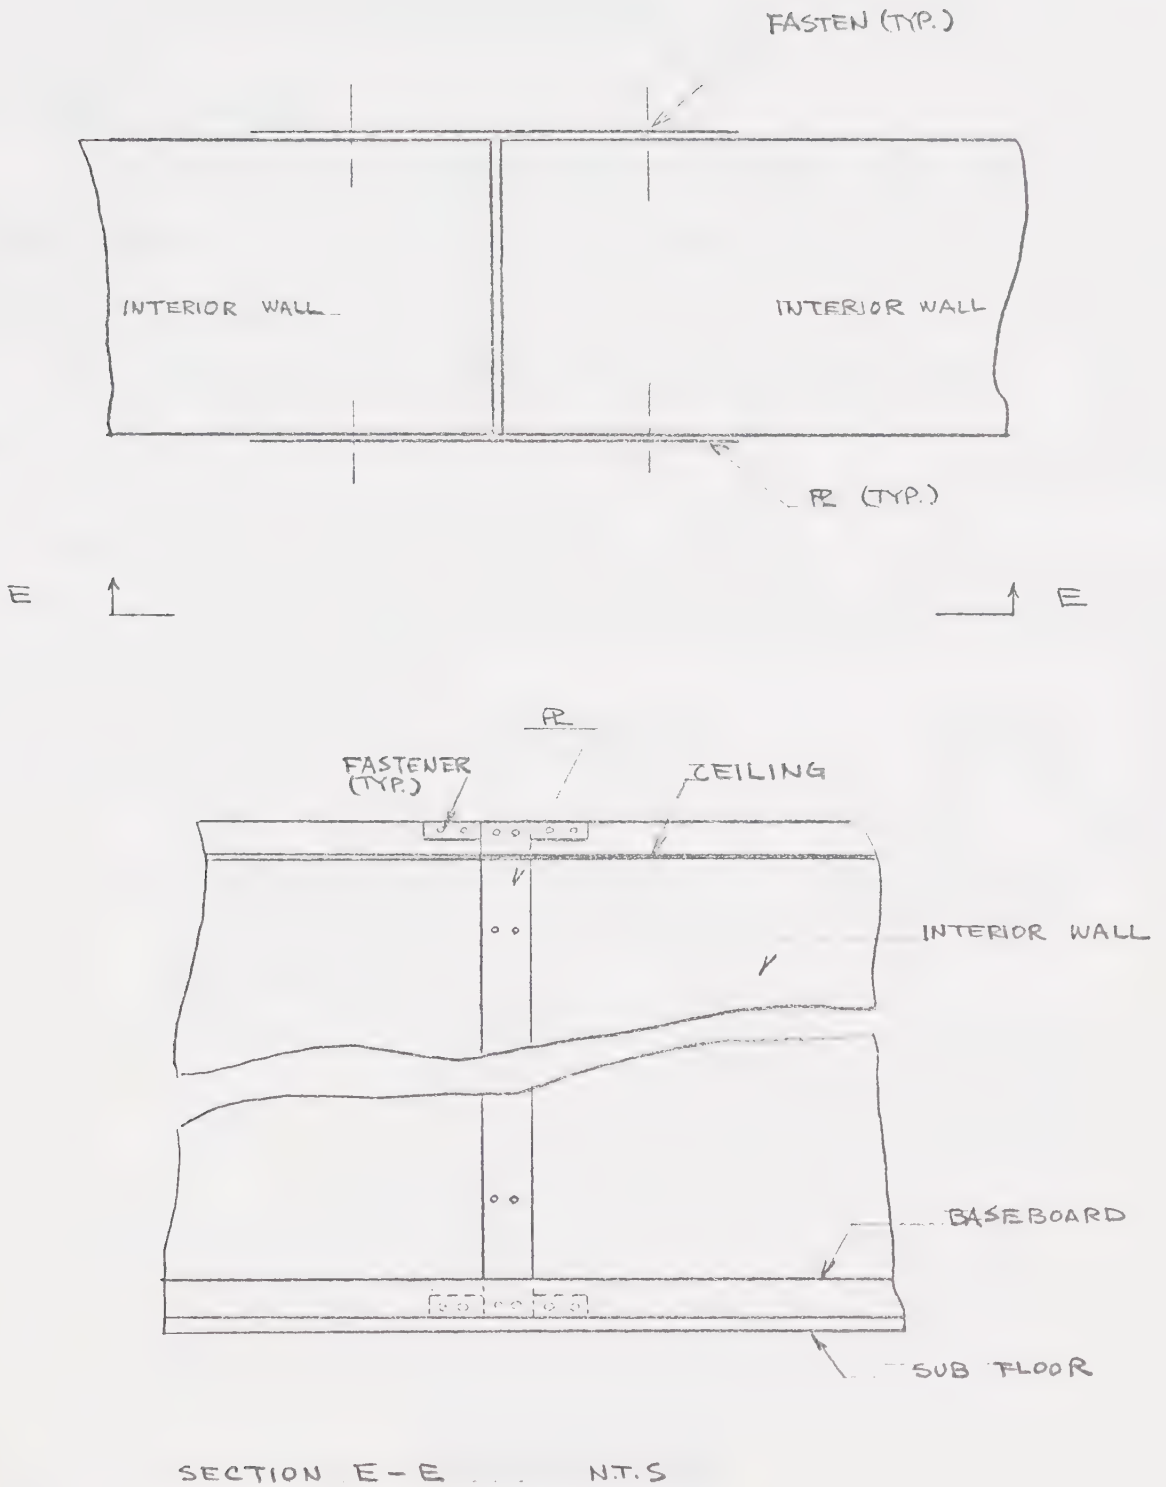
THE STRAIGHT CONNECTION FOR INTERIOR WALL PANELS
